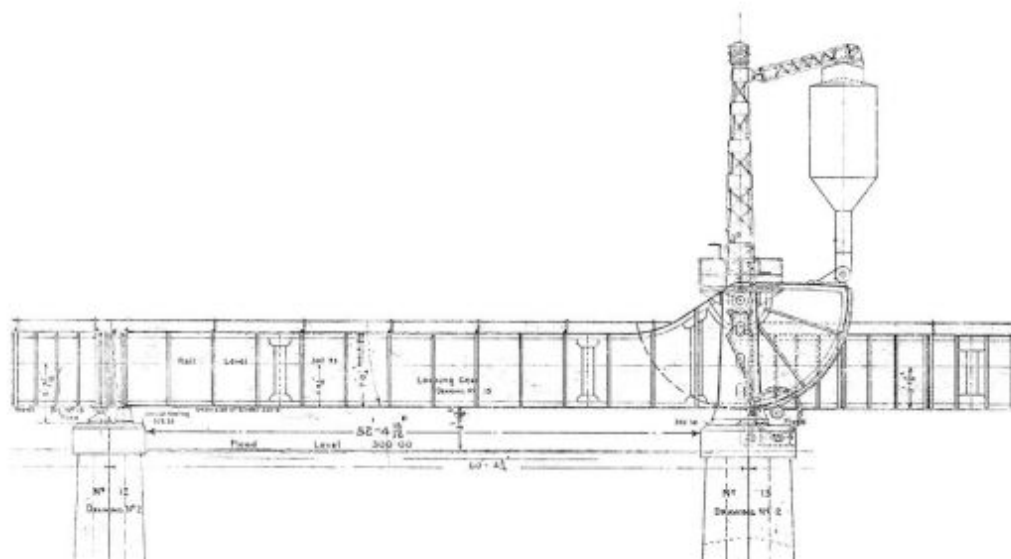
Elevation of the Spit Bridge 1924 (Source: Sydney Harbour Trust NRA Archive)
